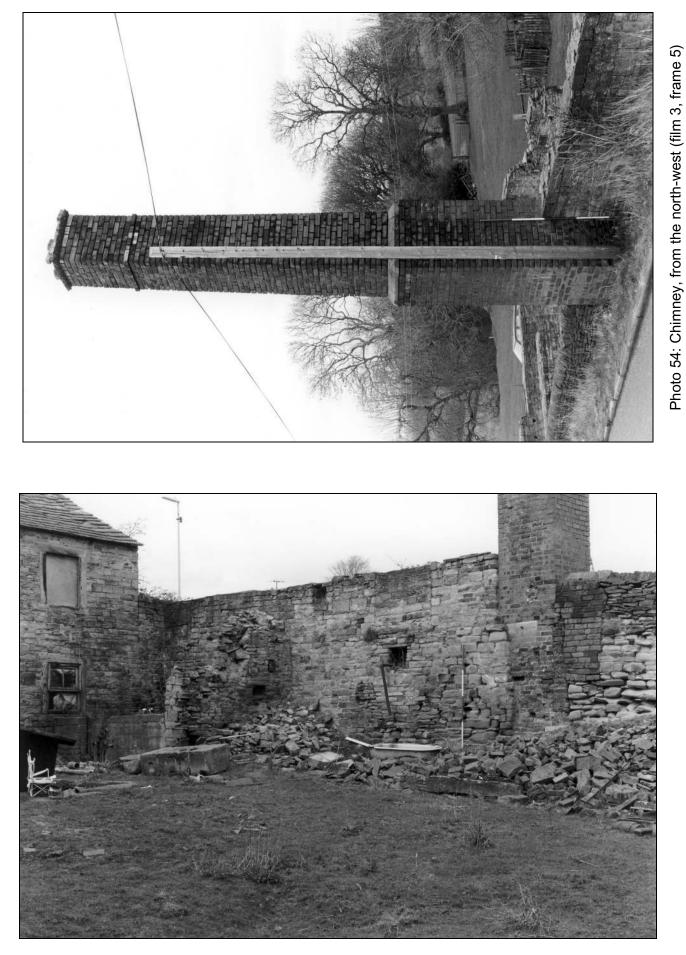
Remains of buildings at foot of chimney, from the south-east (film 2, frame 1)
